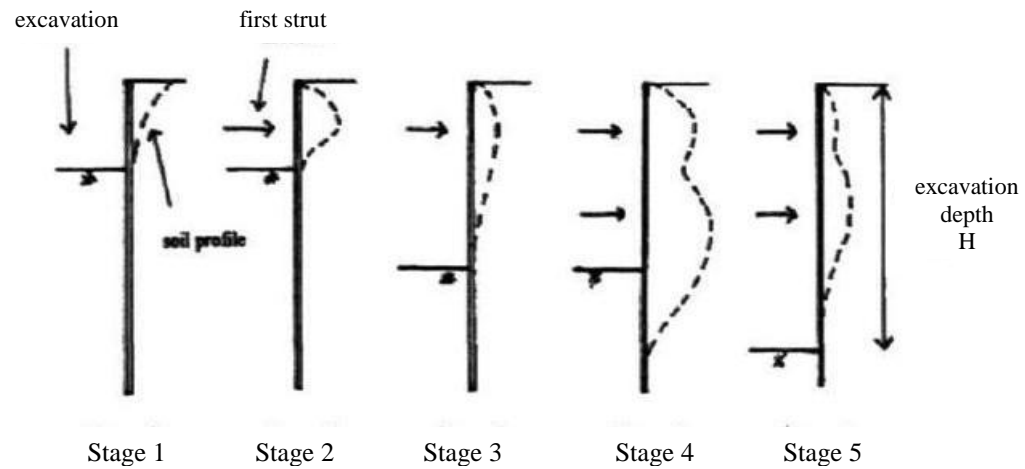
Pressure Distribution Profile in Braced Excavation
